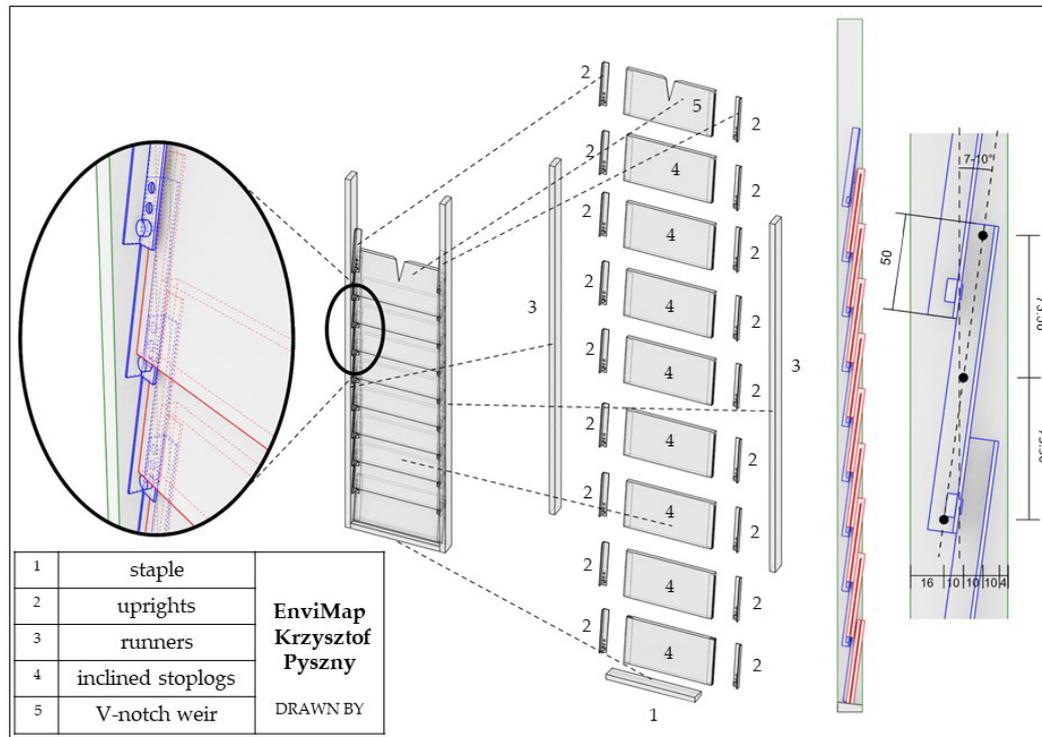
Assembly drawing of the WCS using an angle bar profile as a truck element to fasten boards.
